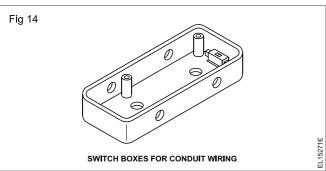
shows typical ceiling boxes, and Fig 13 shows wall boxes whereas Fig 14 shows switch boxes.
